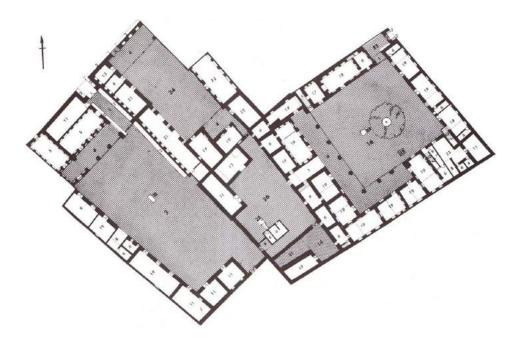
The layout plan of the historical building in Kuwait (Al-bader house) that shows the multiple courtyards in same building area (*Lewcock*, 1978)
